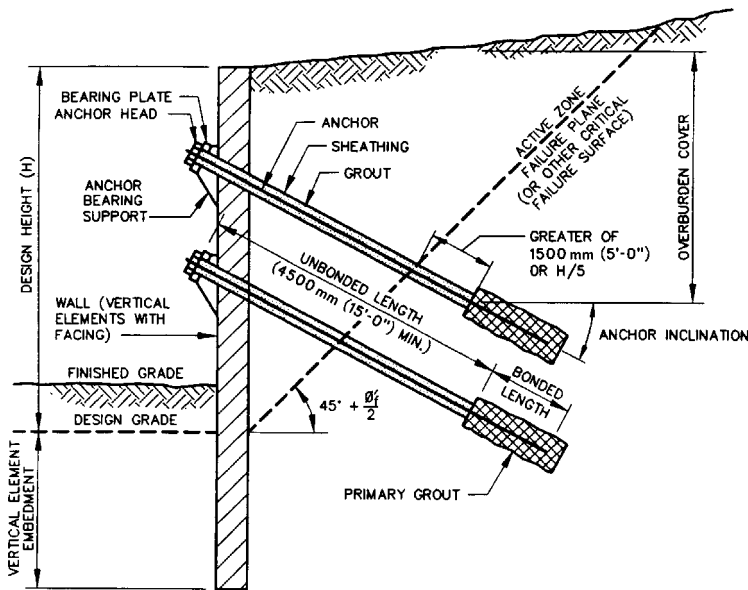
Anchored Wall Nomenclature and Anchor Embedment Guidelines
